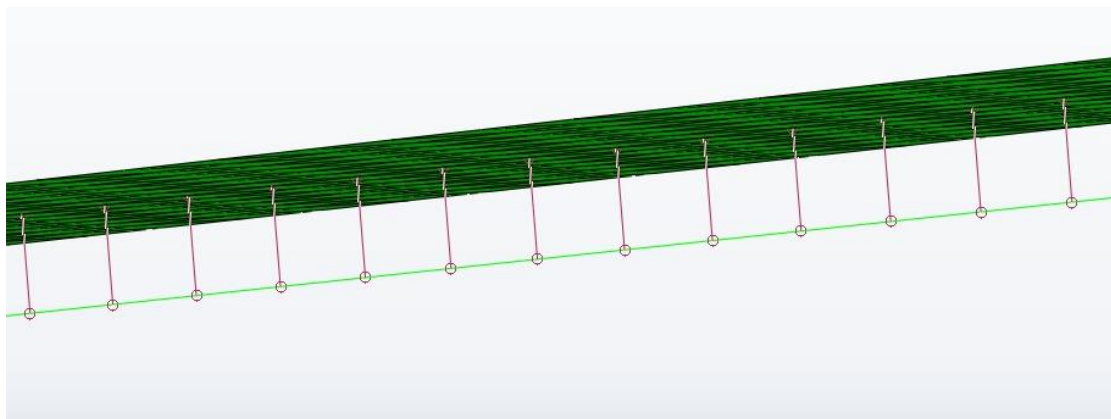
Tie connection between bridge deck and beam. Picture from BRIGADE/Plus.
